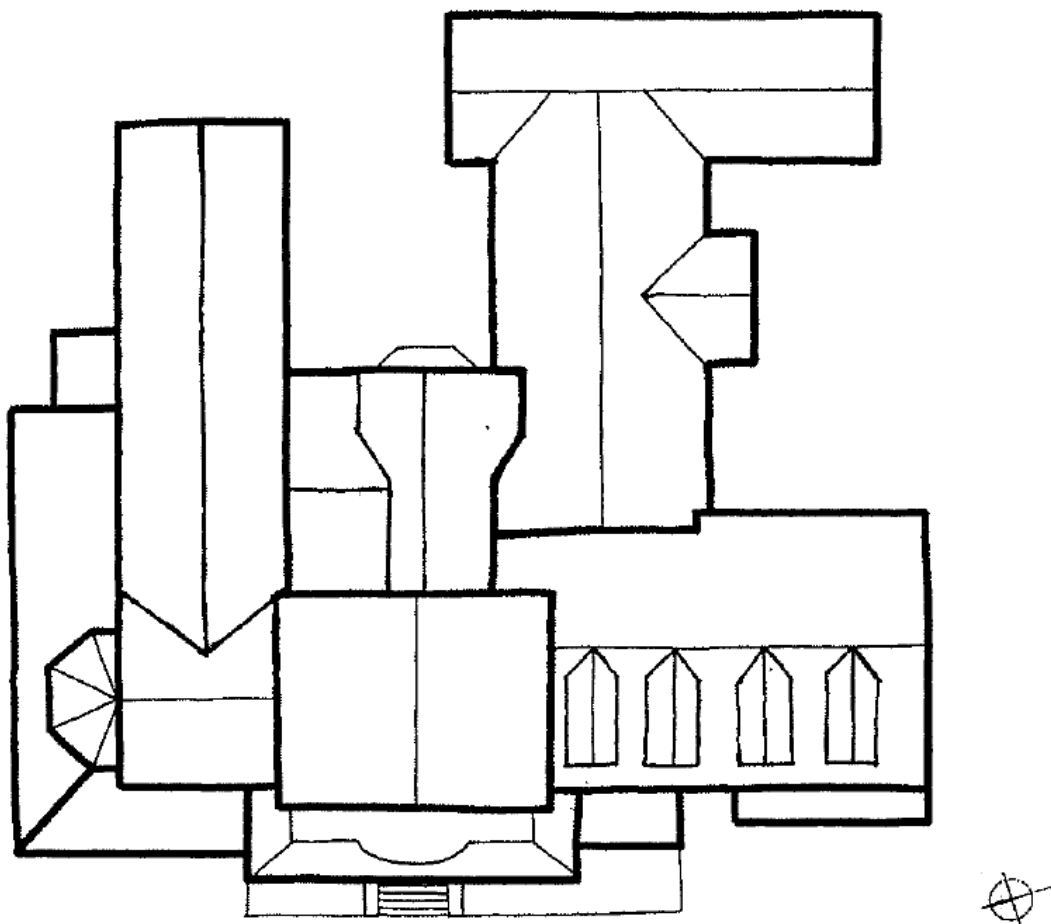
Roof Plan for Tivoli (CMP 2004 Noel Bell Ridley Smith & Partners Architects)
